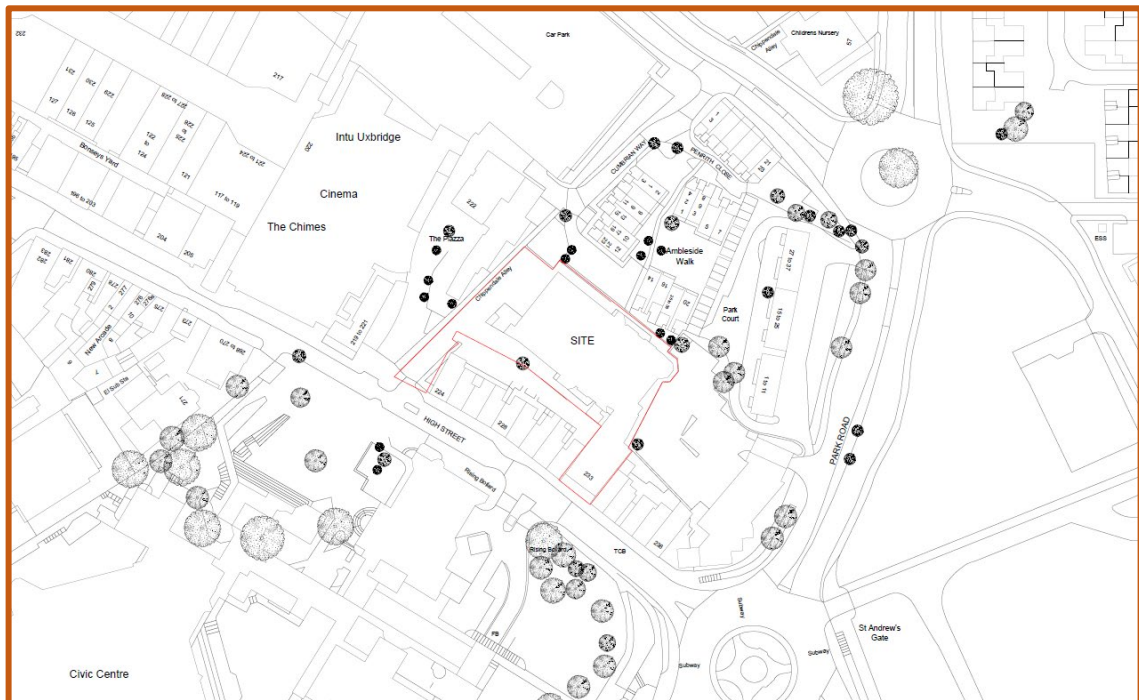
Site Location Plan (Source: Nick Willson Architects)
